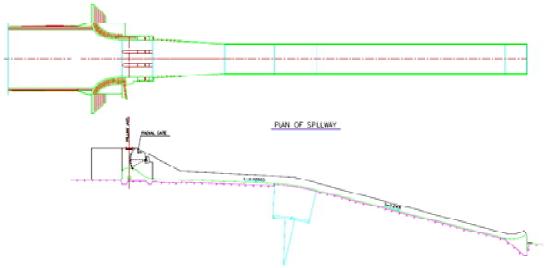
A view of the plan and longitude section of the Jarreh's spillway model
